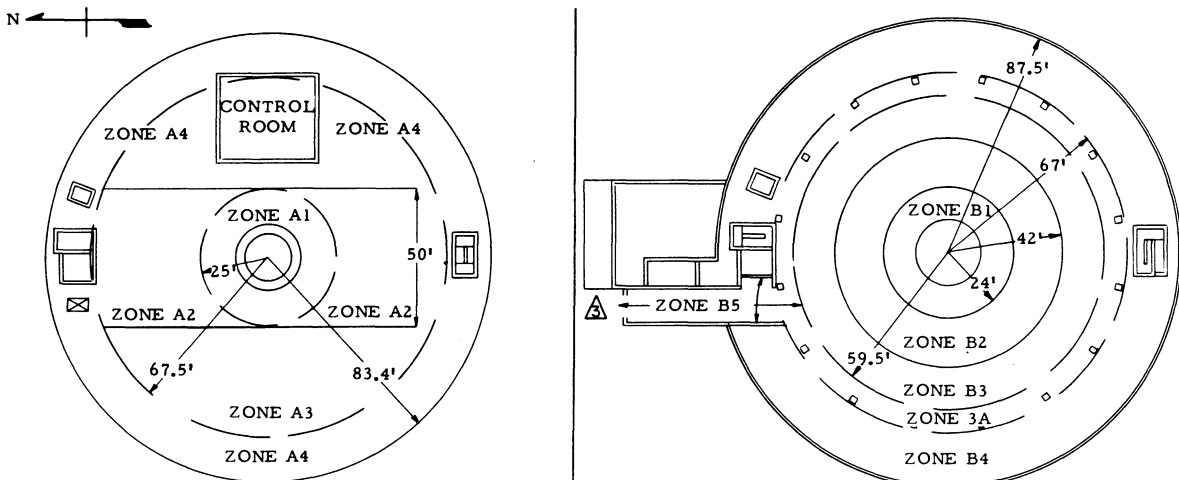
Plan of the operations level of the HFBR building at elevation 141 ft-6 in.
